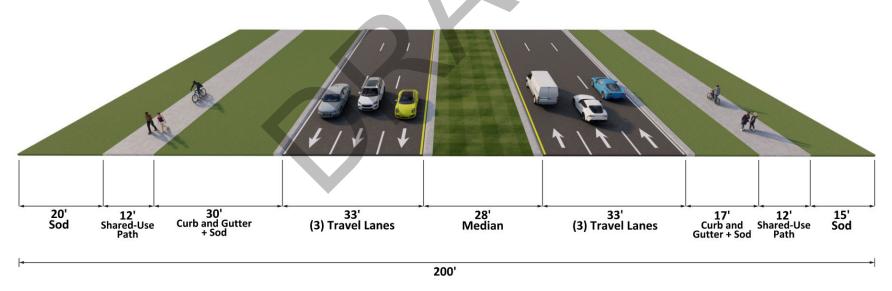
Alternative B – US 41 from Springs Plaza/Access Road to Southern Crossover
